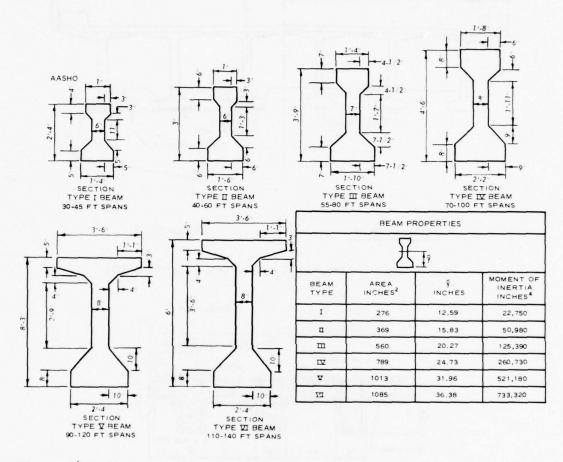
Dimensions and section properties for AASHO standard bridge beams (from Reference 17)
